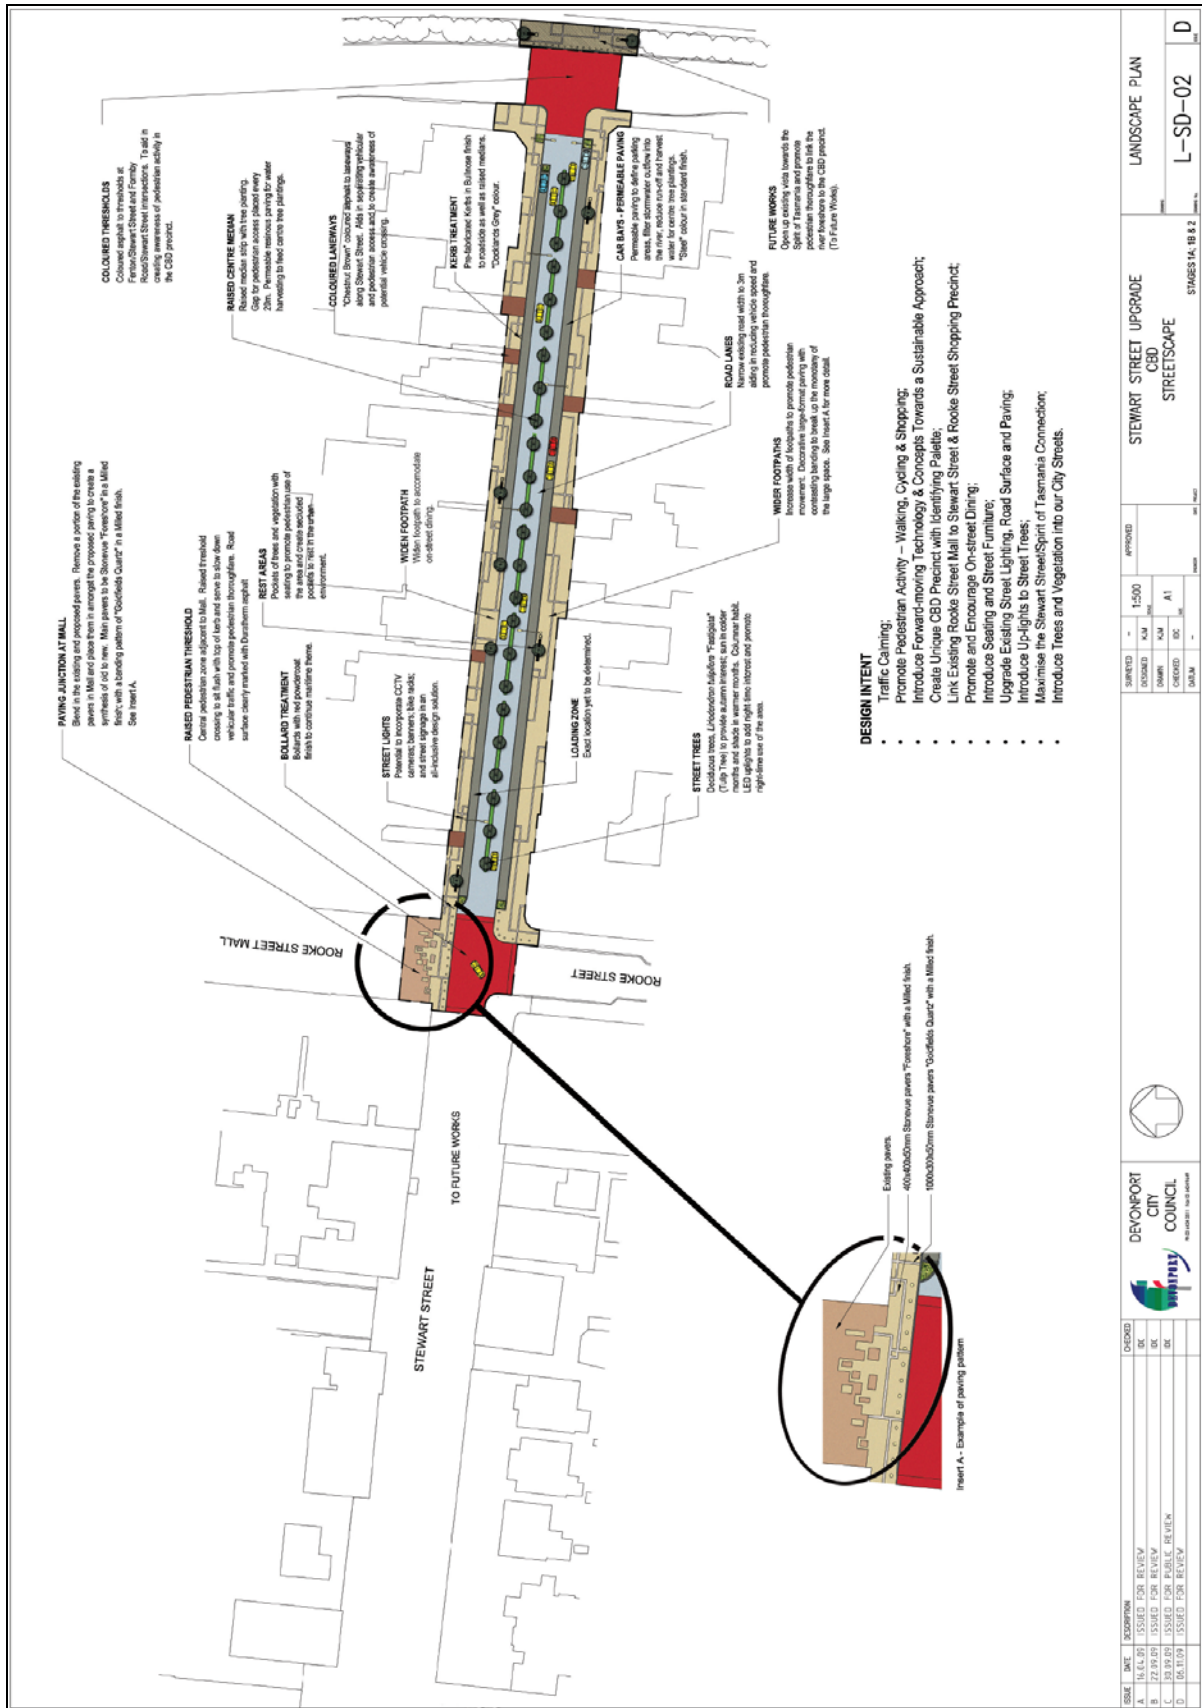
Stewart Street (between Formby Road and Rooke Street) Conceptual Design Landscape Layout Plan
